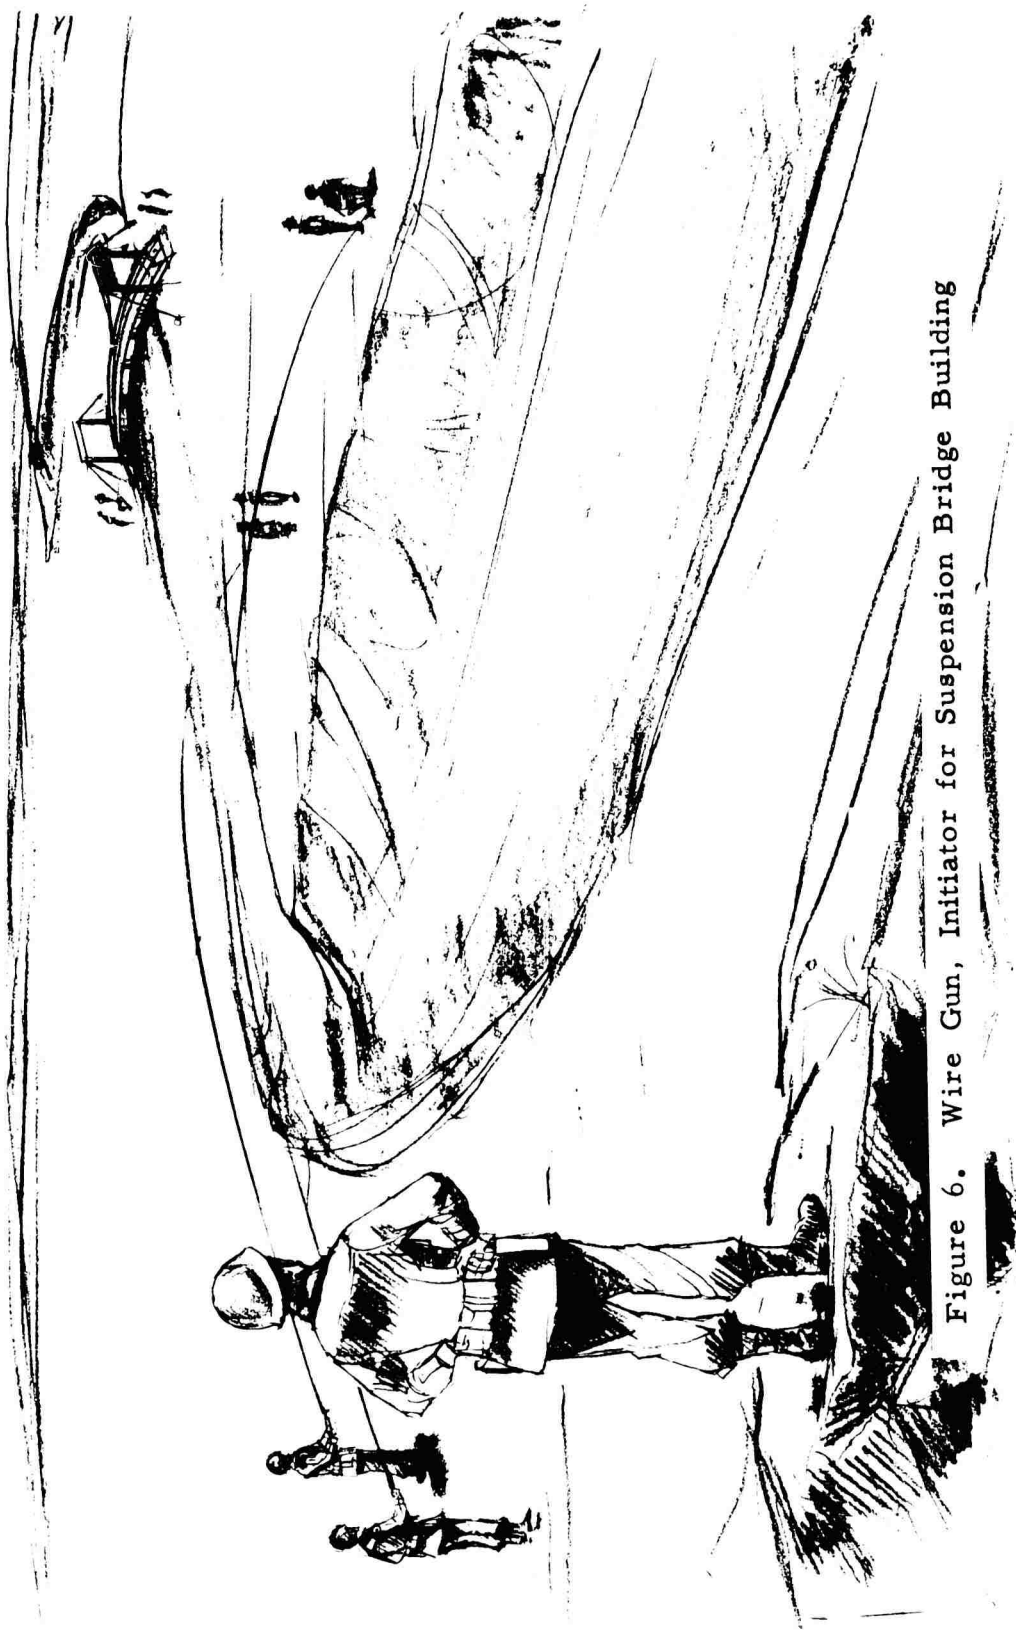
Wire Gun, Initiator for Suspension Bridge Building
